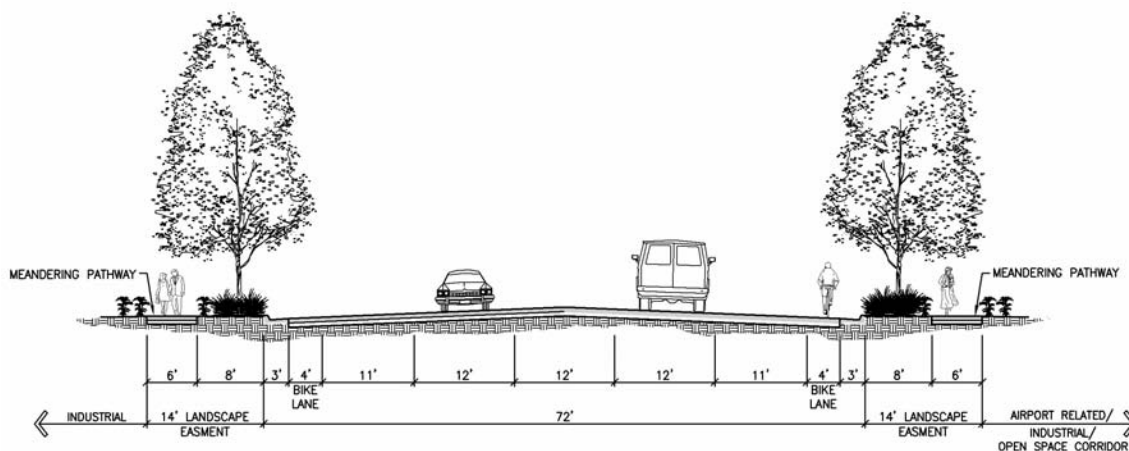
EXHIBIT - ELVERTA ROAD/LONE TREE ROAD/MEISTER WAY (EAST OF METRO AIR PARKWAY)/*NEW ROAD DRIVE/POWER LINE ROAD
